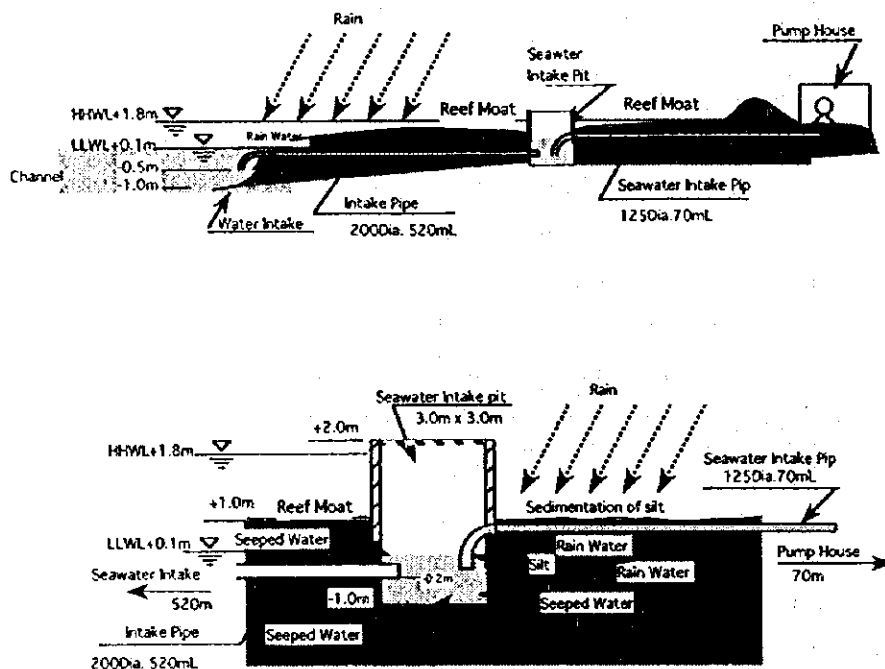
Present Condition of the Intake Pit and Inlet Piping
